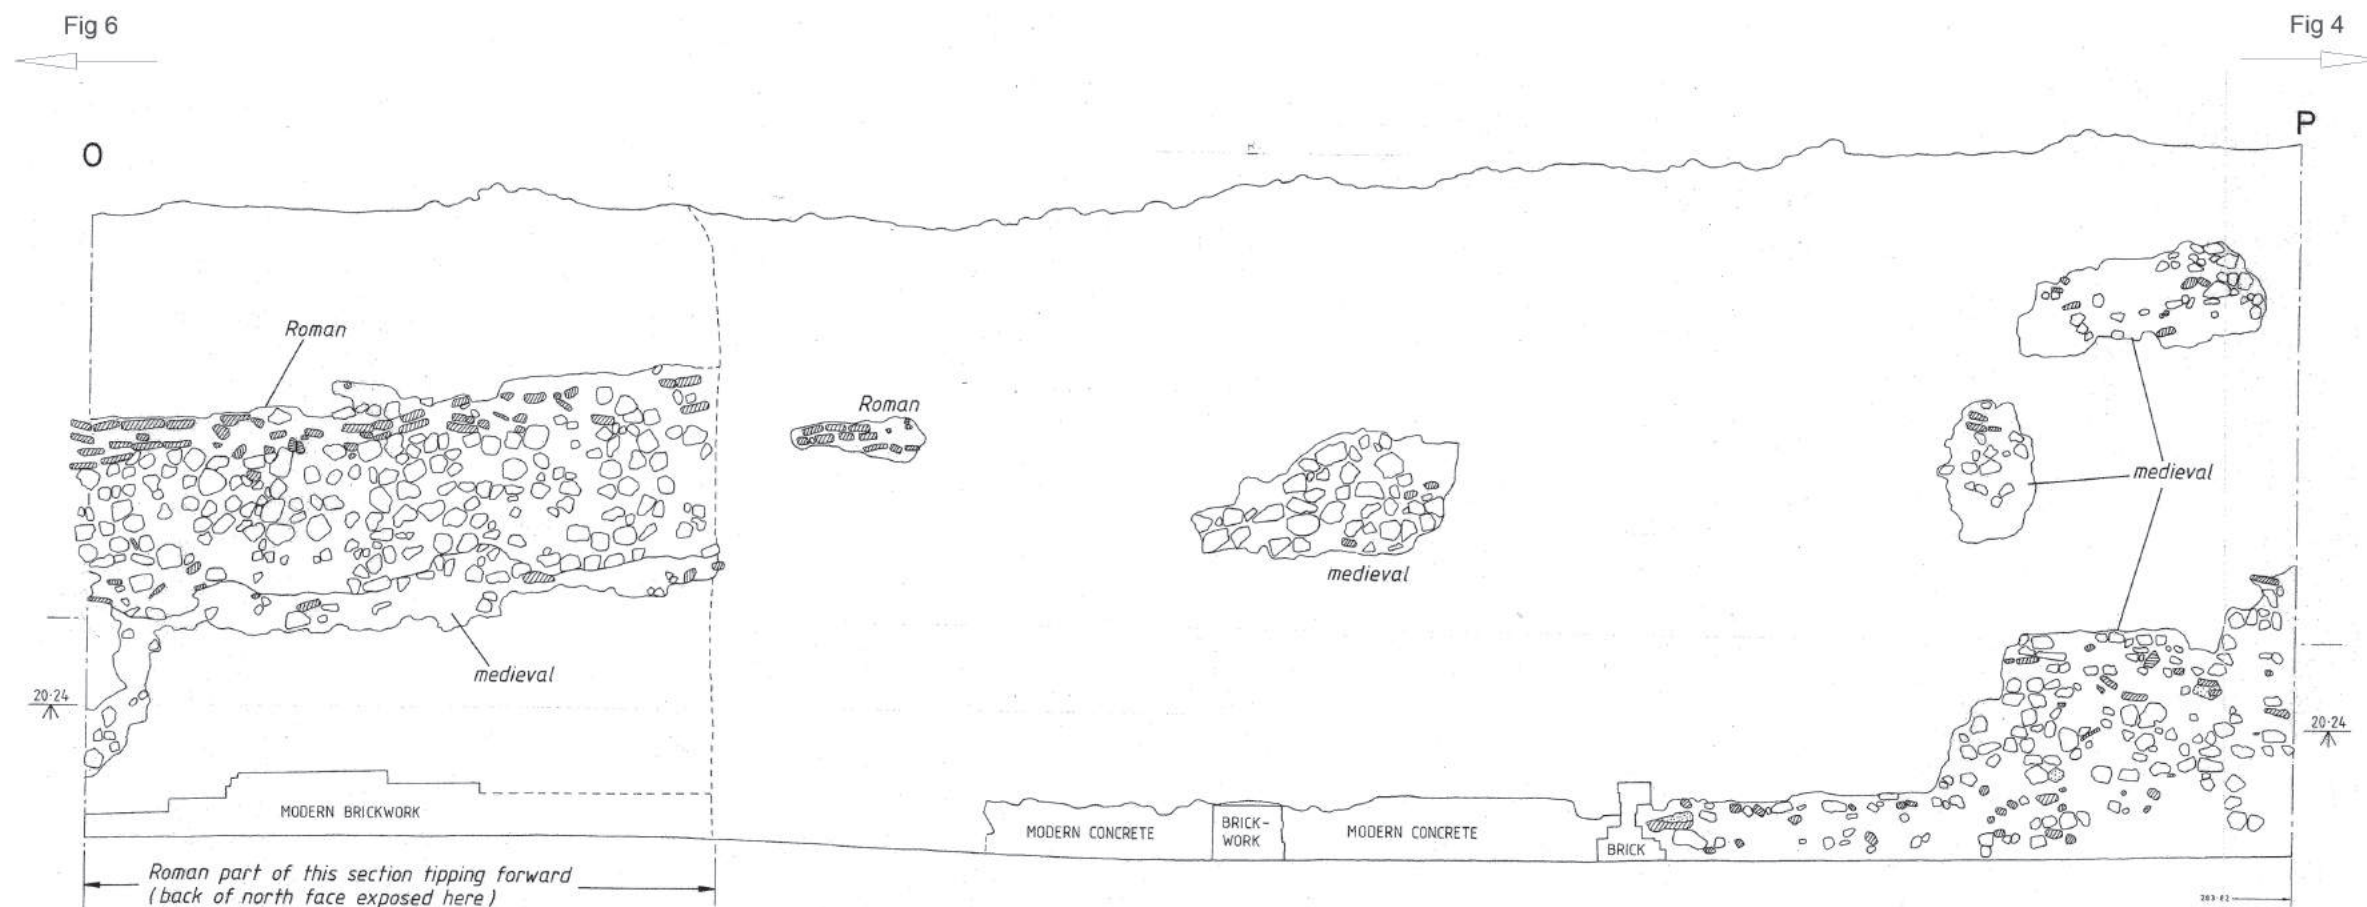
Elevations of Section 10 of the town wall, nearest to Section 11. Drawn in 1988-9.
